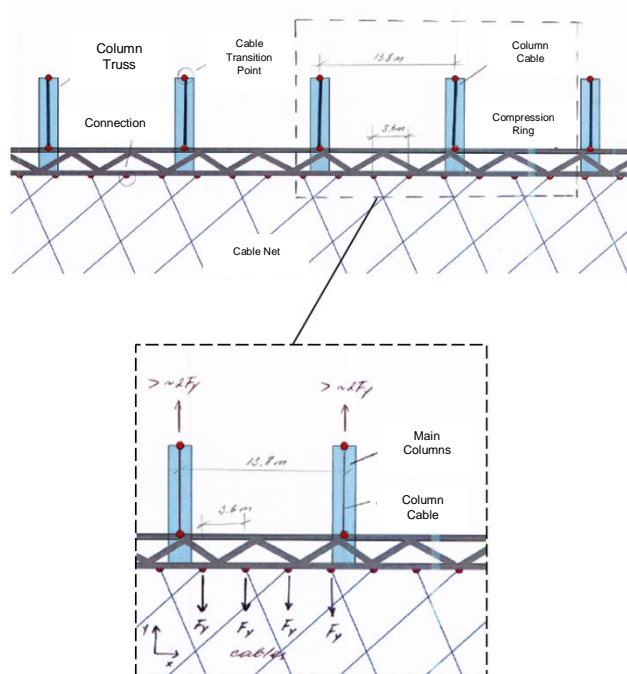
Top View: Cable-net + Compression ring + Column Truss + Guyed Truss
